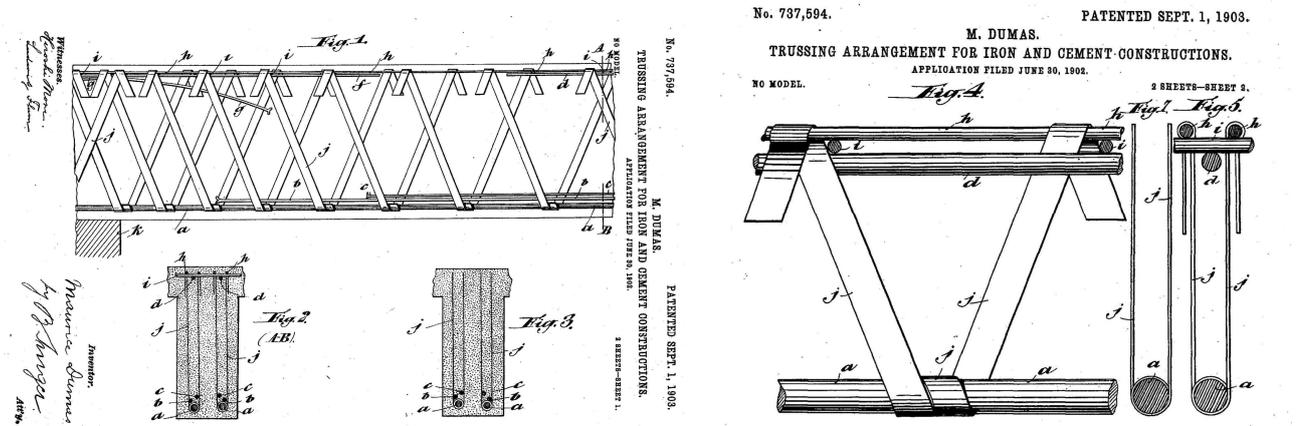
Patent 'trussing arrangement for iron and cement constructions' from Maurice Dumas (Patent 1903)
